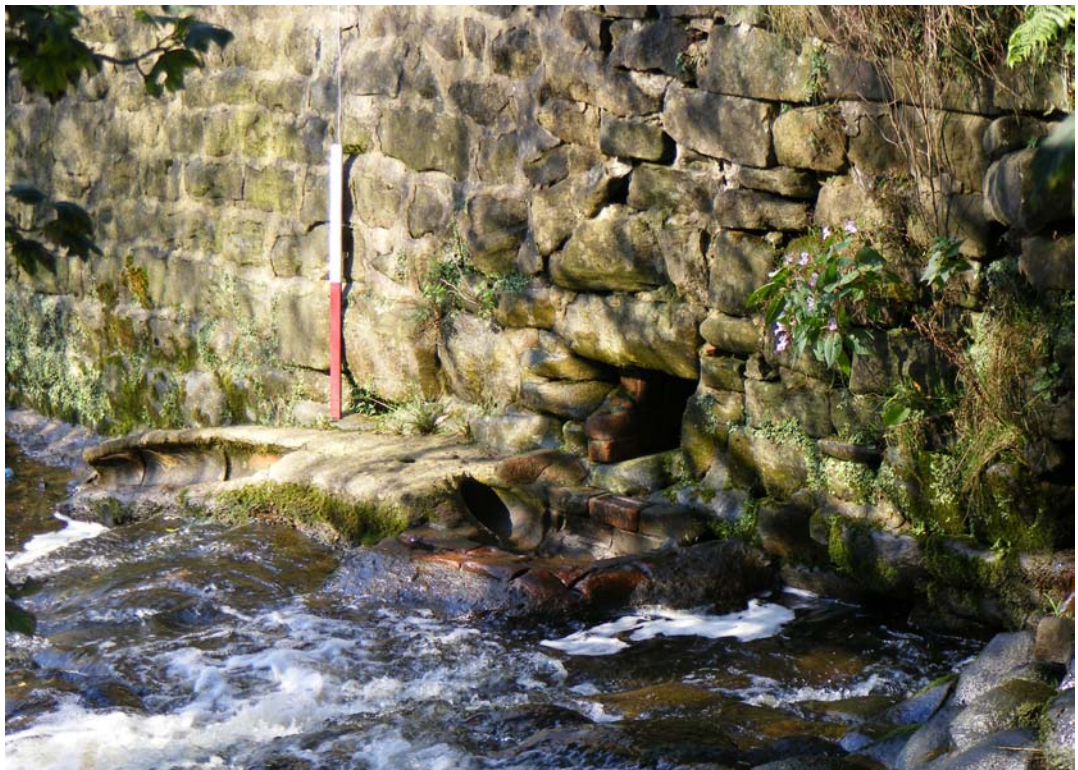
Western outlet in right wall just beyond foot of Weir 1
